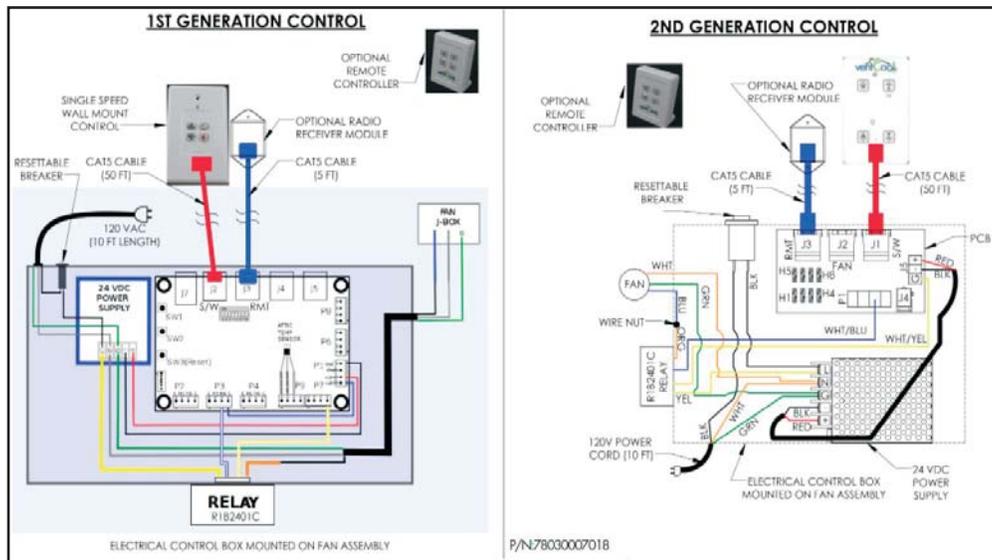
Ventcool 1.8 Electrical Wiring (Electrical Box is Mounted to Fan Assembly)
